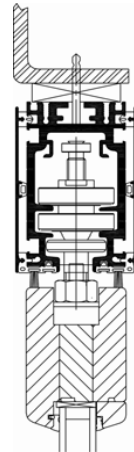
HEAD JAMB with adjustable rod anchorage system.
